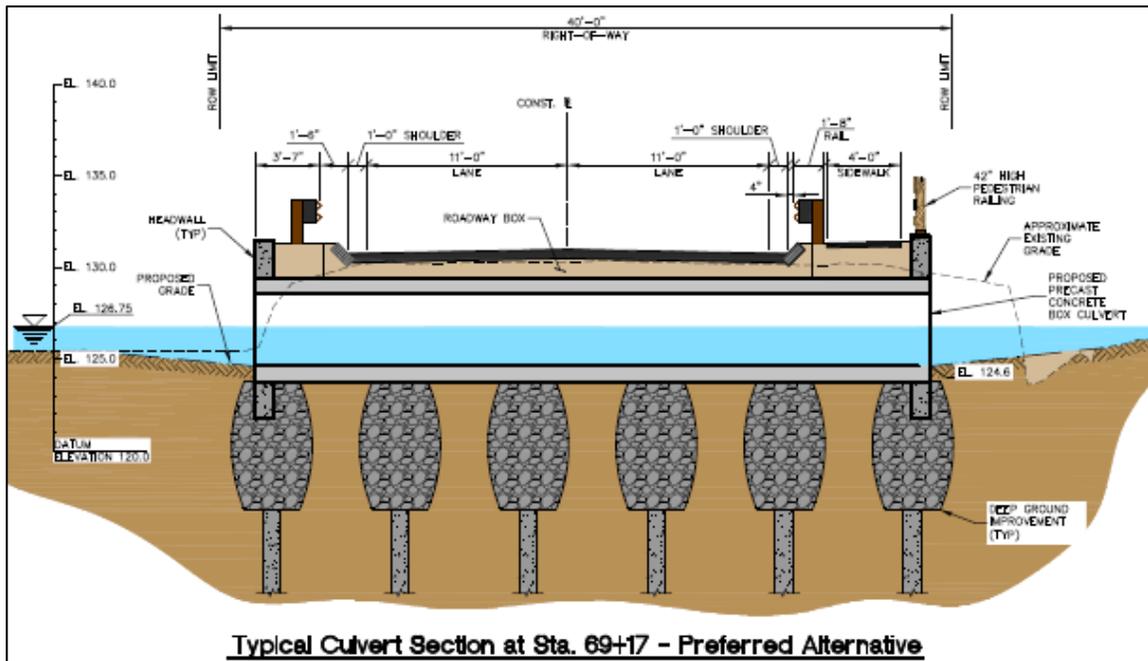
Typical Culvert Section at Sta. 69+17 – Preferred Alternative
